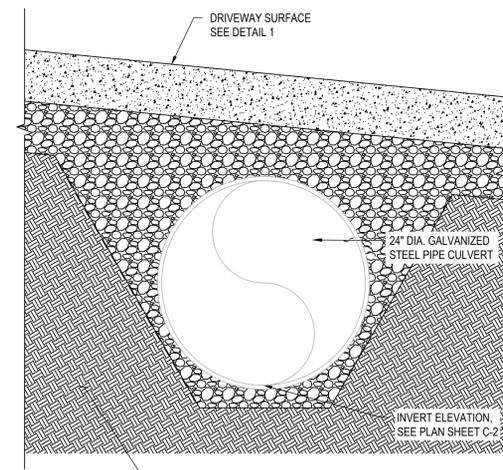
DETAIL DRAINAGE DITCH 9 NOT TO SCALE
